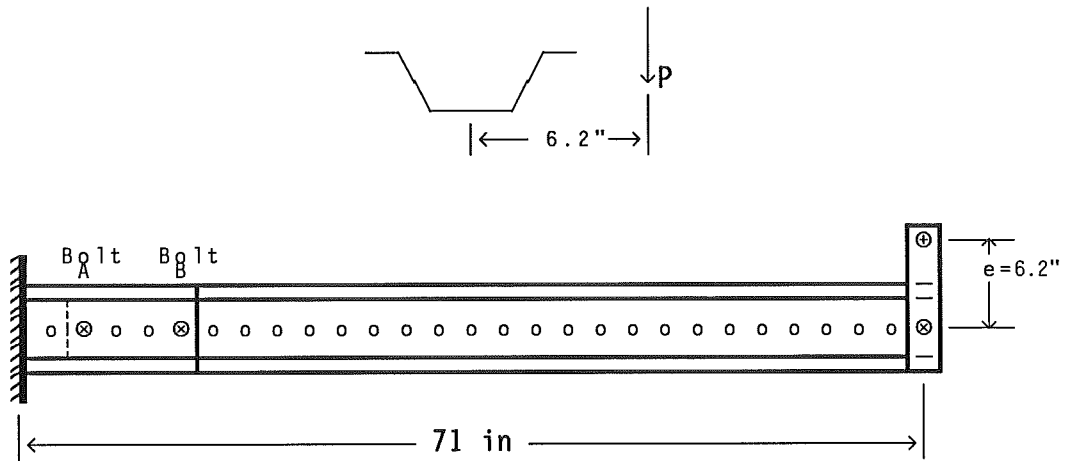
END AND PLAN VIEW ILLUSTRATIONS OF COMBINED BENDING AND TORSION TEST SETUP DEMONSTRATING THE ECCENTRICITY IN THE APPLIED LOAD.
